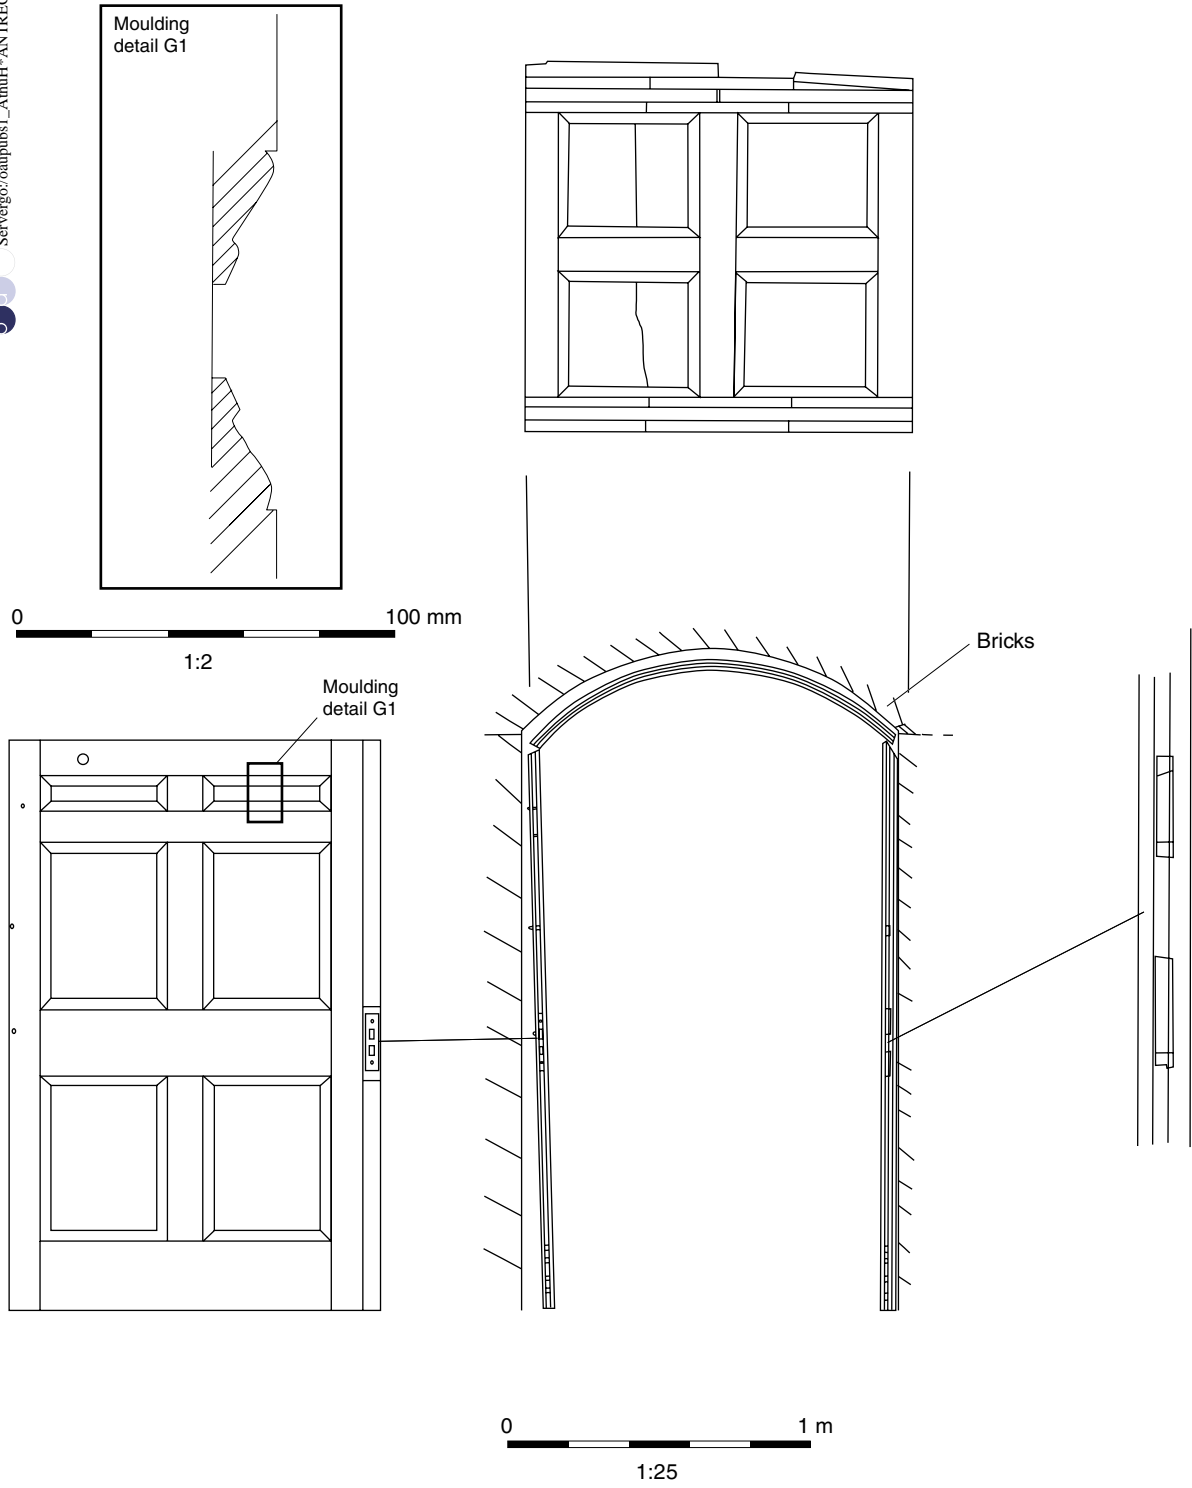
Panelling of passageway from room 13 to room 17A, (Feature G)
